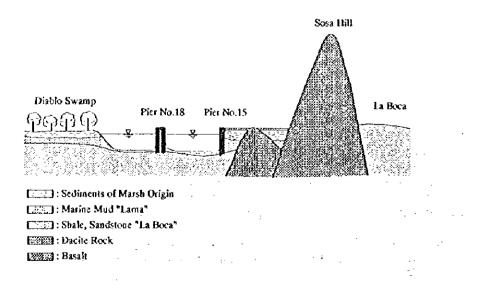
Illustration of Sub-Soil Formation at Port of Balboa
